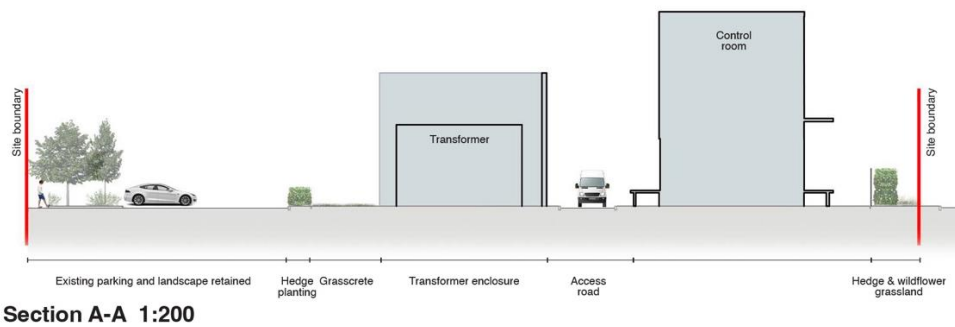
LONDPSS2-MWL-SS-ZZ-DR-LD-10400 Substation 2 Landscape Sections (NTS)
